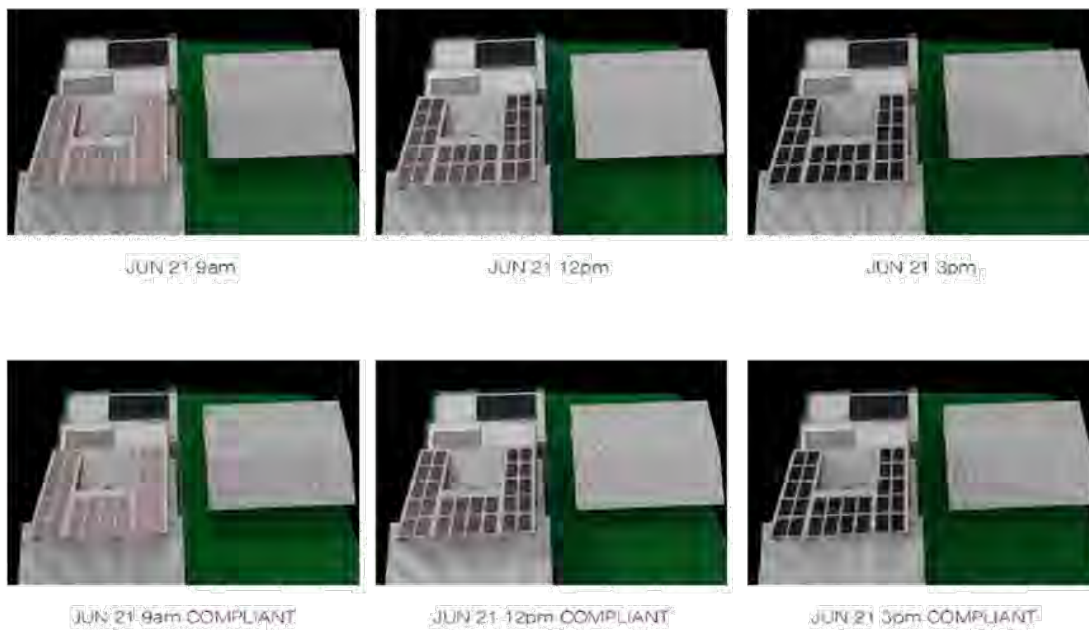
Shadow diagrams provided by architect of the winter solstice. The top three diagrams are the proposed building, whilst the bottom three represents a compliant building, 600mm lower.
